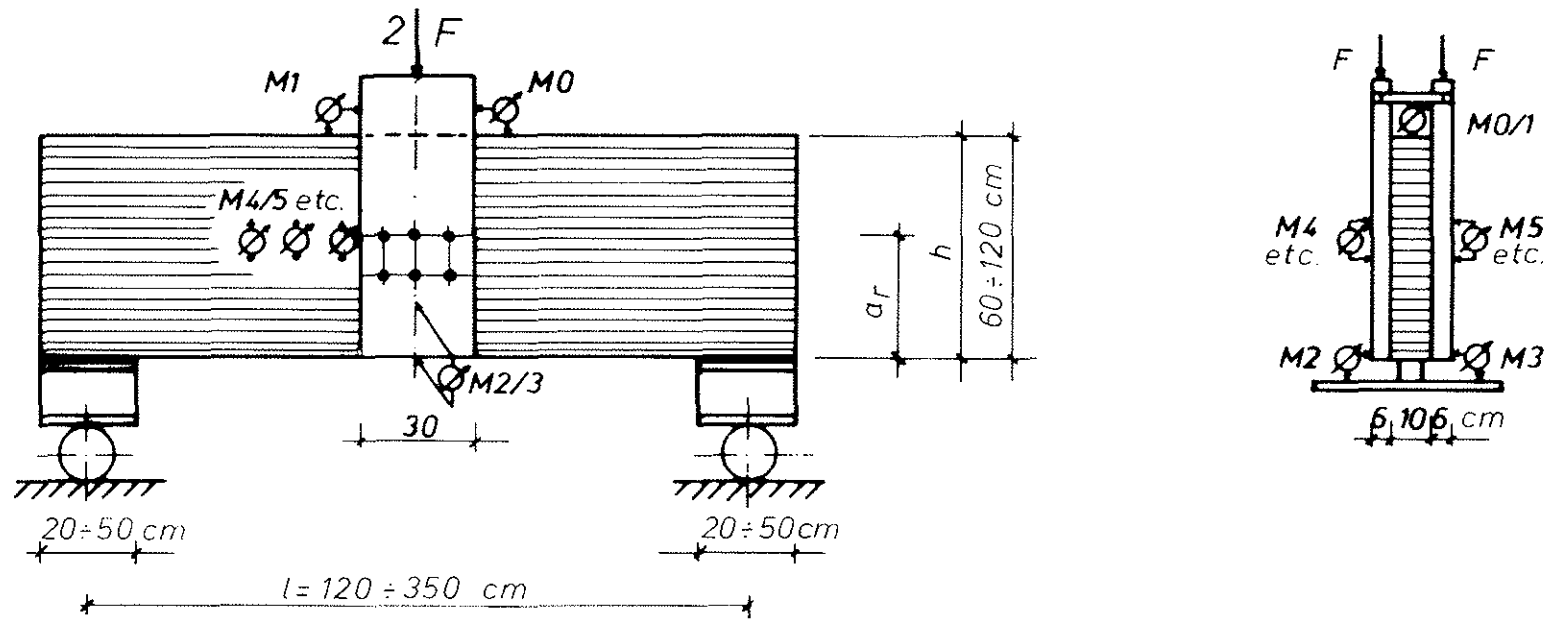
Specimen and test set-up for joints loaded perpendicular to grain
